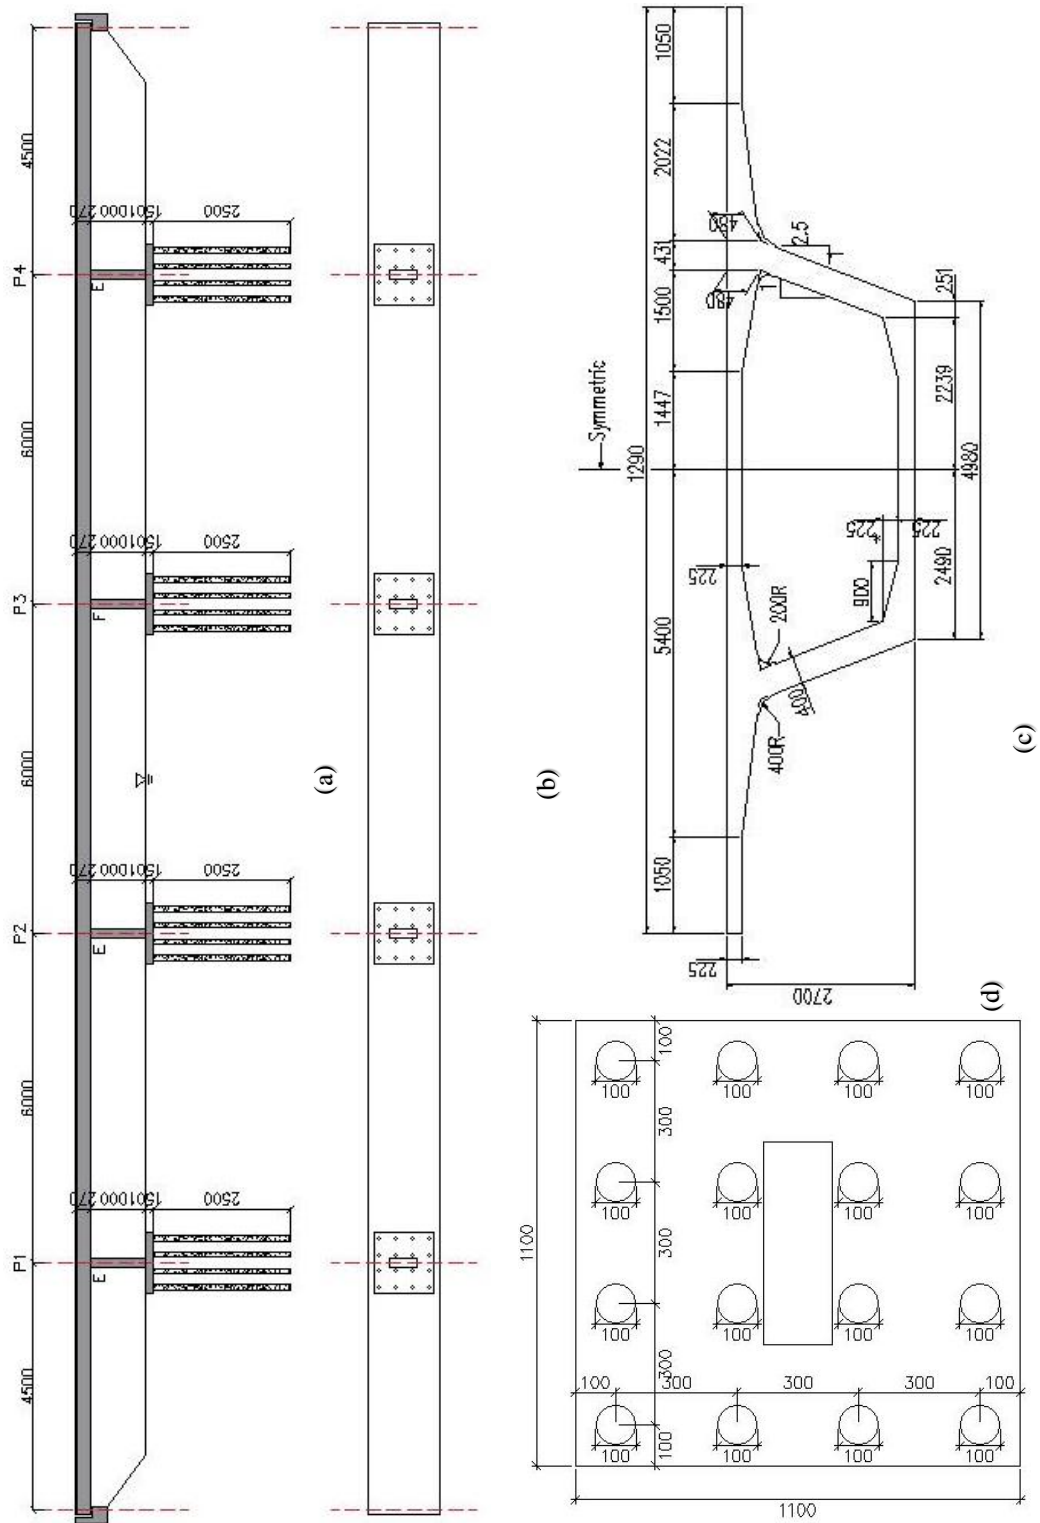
Profile (a), Plan view (b), Box section (c) and Plan view of foundation (d), in cm
